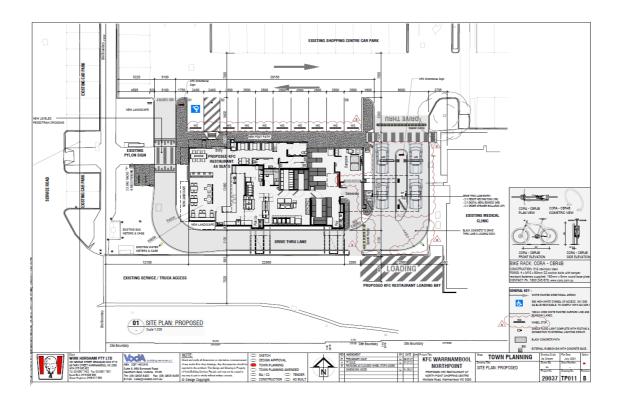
Proposed floor plan (Source: Plan submitted by the applicant)
